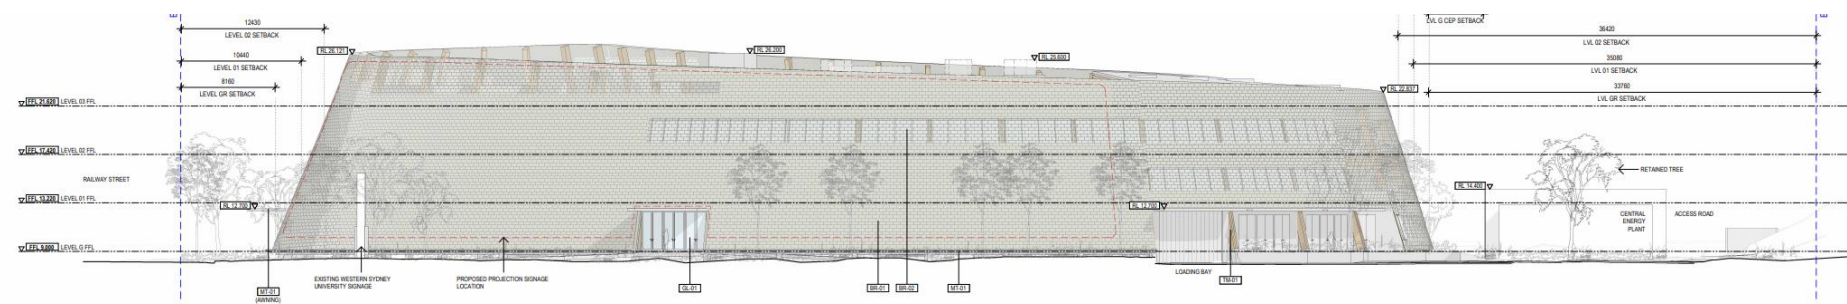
North Elevations. Source: Jackson Clements Burrows Architects 2024
